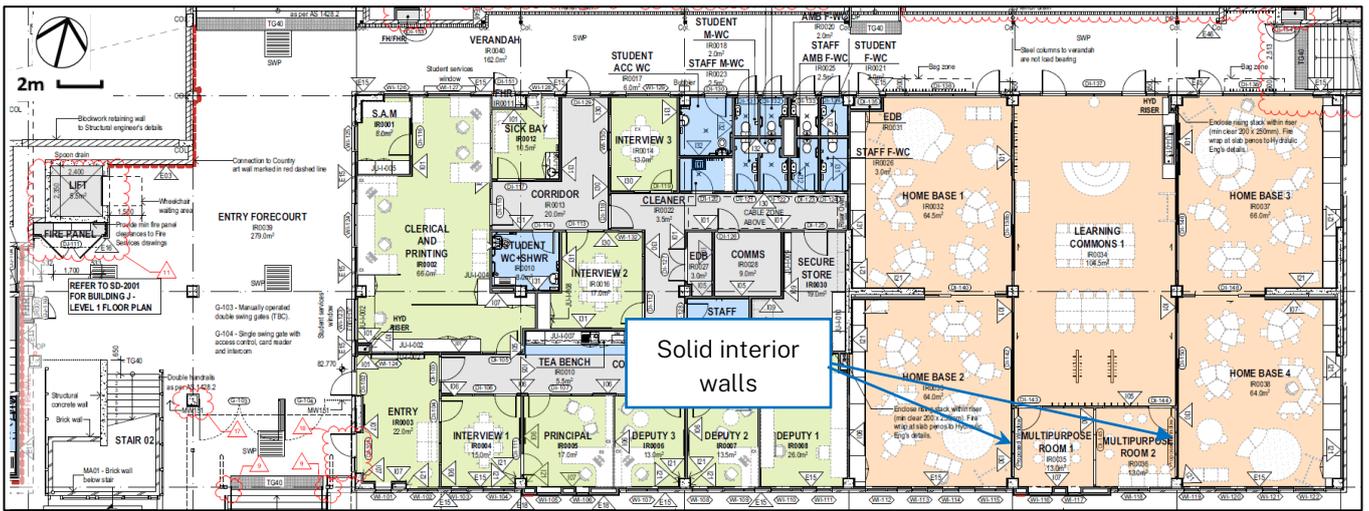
| Approved level 1 floor plan of Building I (Source: Modification 2, 2023)
